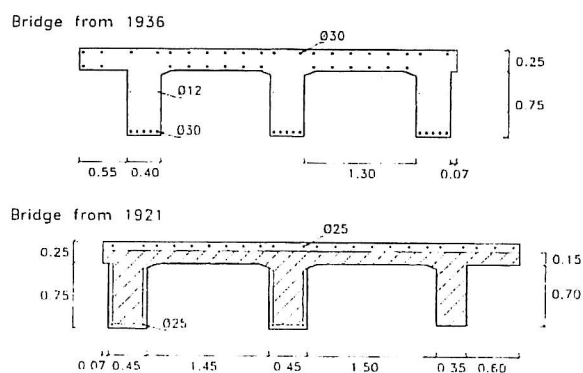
Cross-section of the bridge (midspan). Stirrups are not shown.
